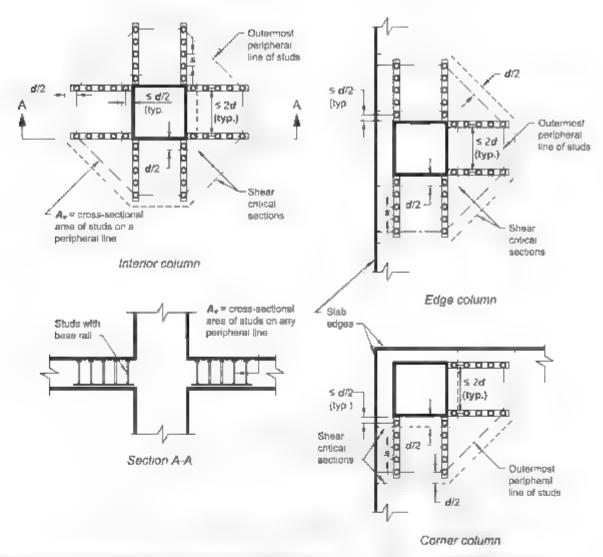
Typical arrangements of neaded shear stud reinforcement and critical sections (Code Fig. R8.7.7).
